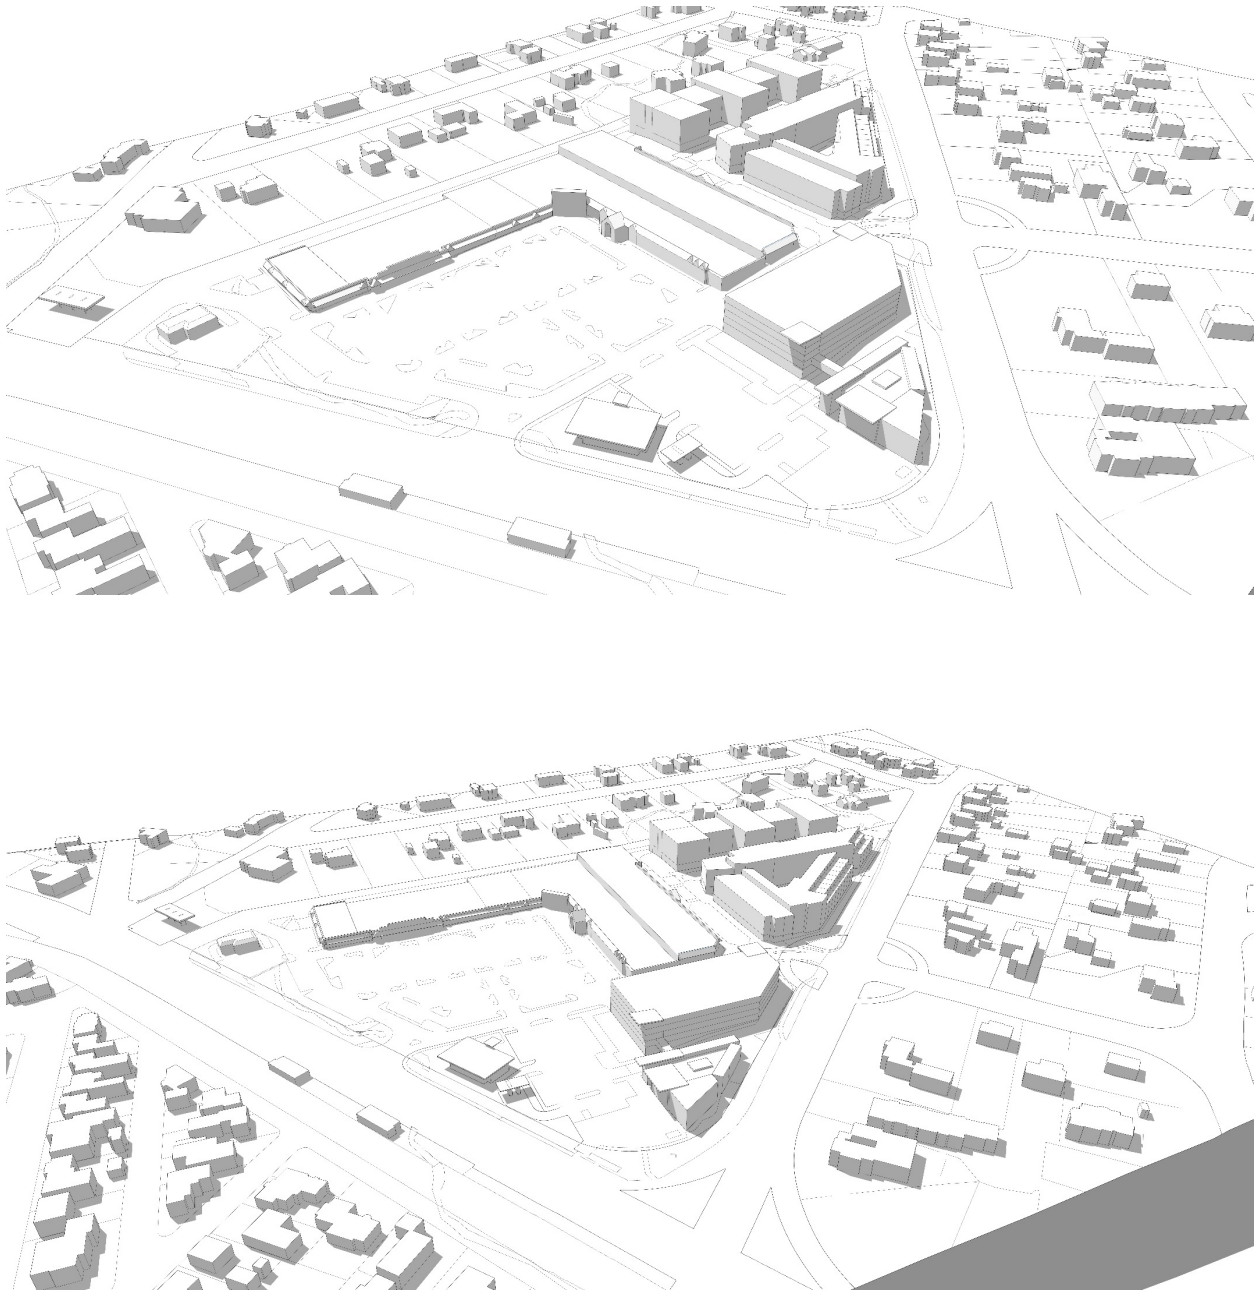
Alternative 1 Plan View, 3-D Sketch Models, and Elevation Views
